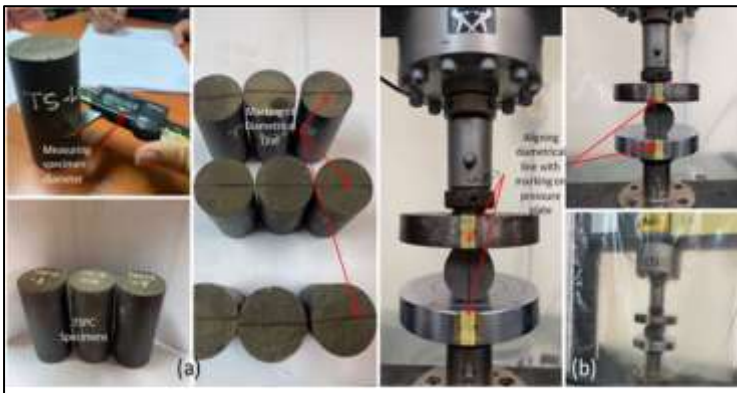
Samples and mechanical testing (a) Specimen preparation process and diametrical line marking (b) Testing machine setup for splitting tensile test.
